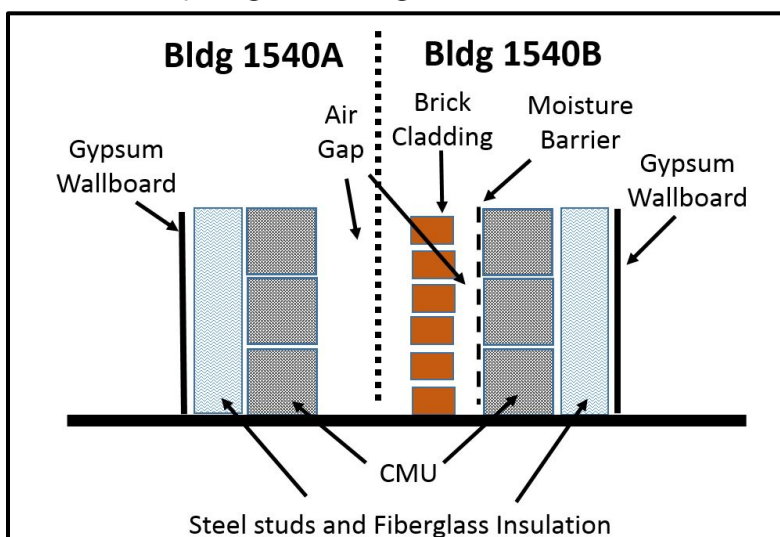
Illustration depicting assumed construction details of air gaps separating adjoining walls of Bldgs 1540A and 1540B.
